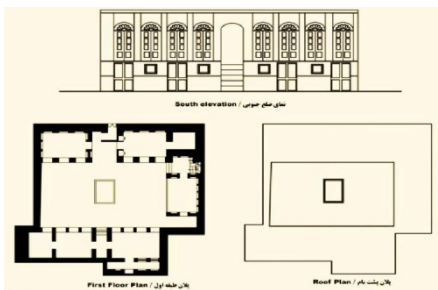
The plan of first floor, roof side and south facade of Karimi house
